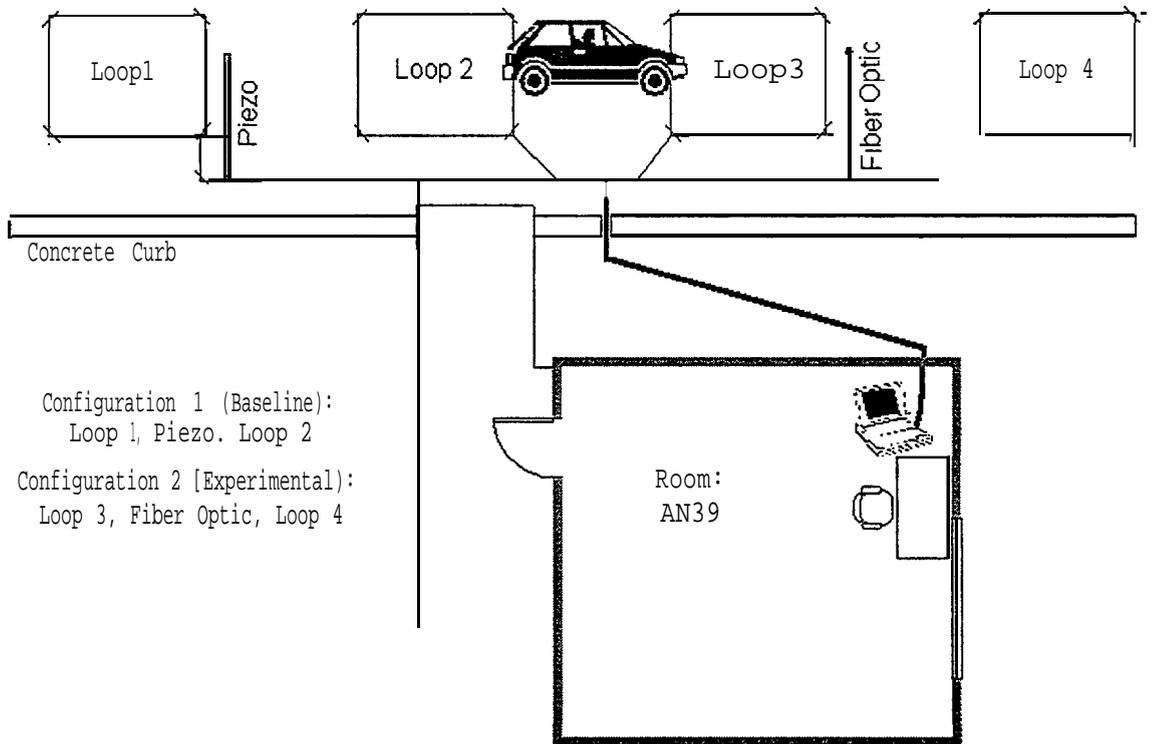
Layout of the Florida Tech Annex Smart Pavement Section
